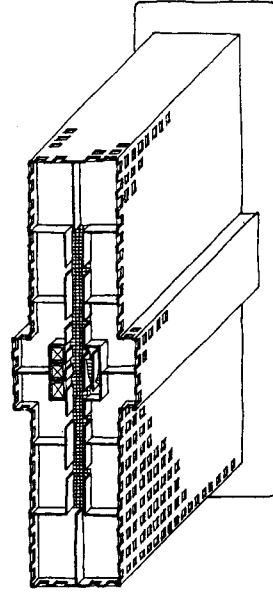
Double-Loaded Corridor Apartment Building. Exploded view of a typical floor of a high-rise double-loaded corridor building. Note position of elevator and scissors stairwell.
